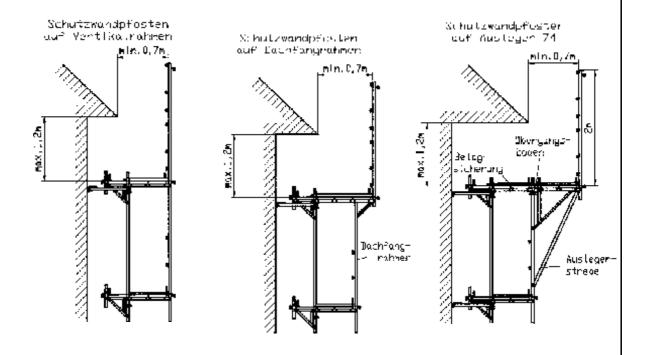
Roof safety scaffold (anchor forces A, B see Table 5)
